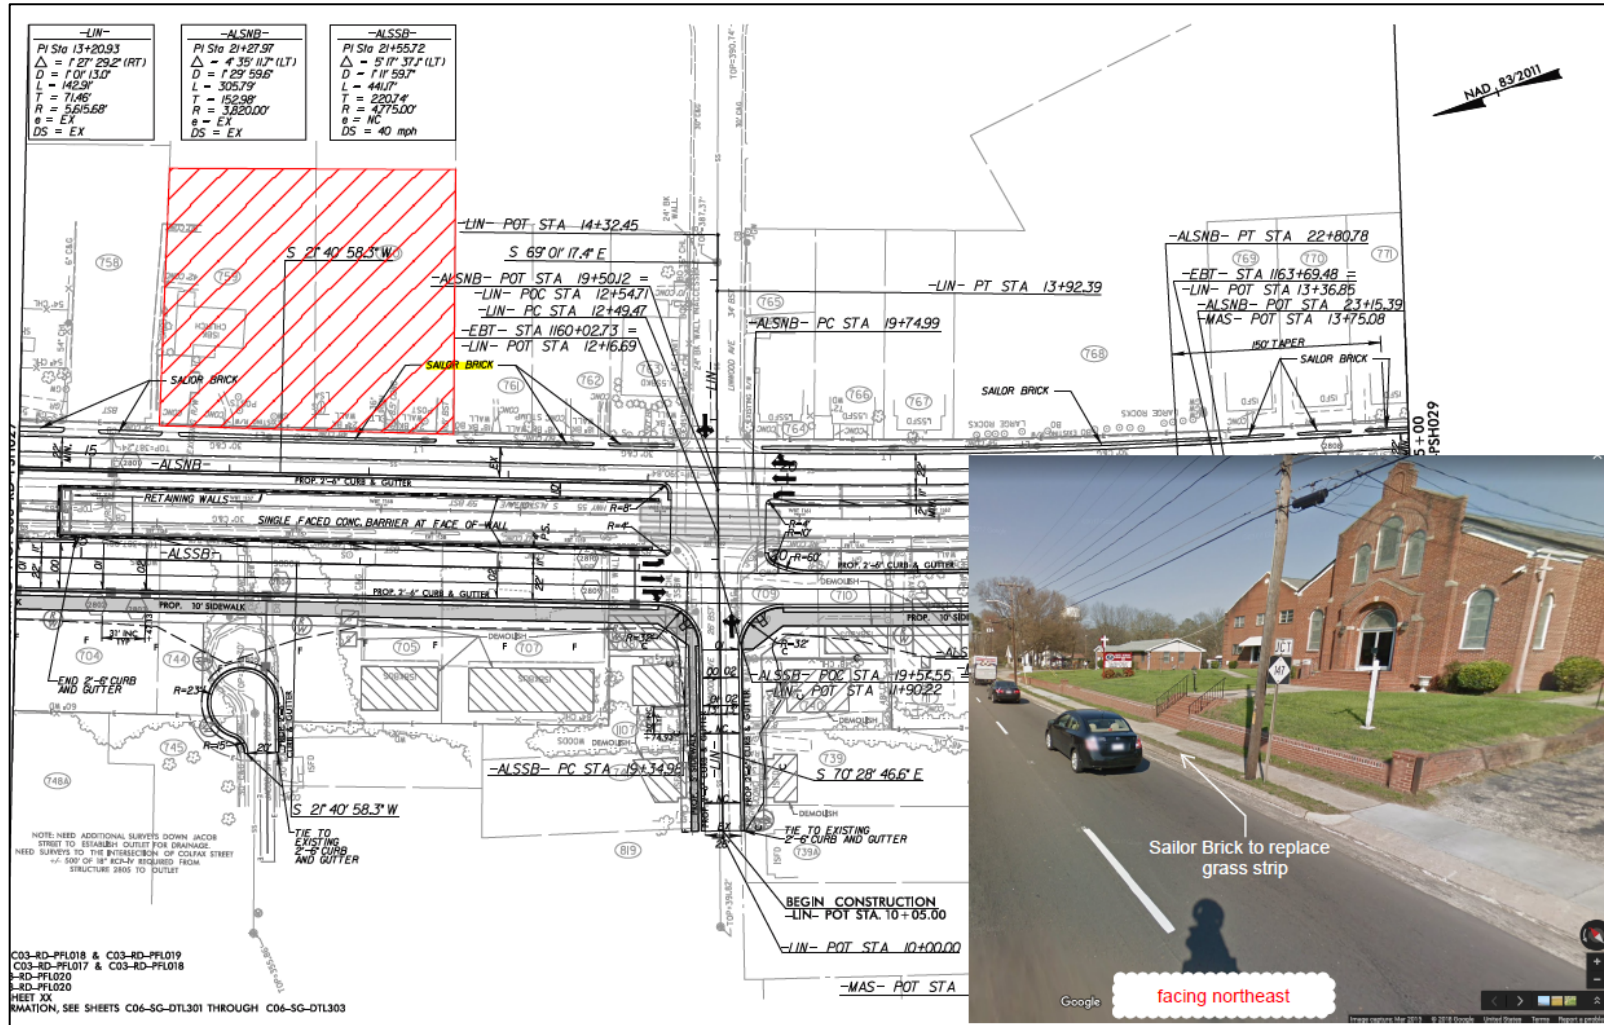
Proposed project plans in area of Russell Memorial CME Church (DH 3663)
